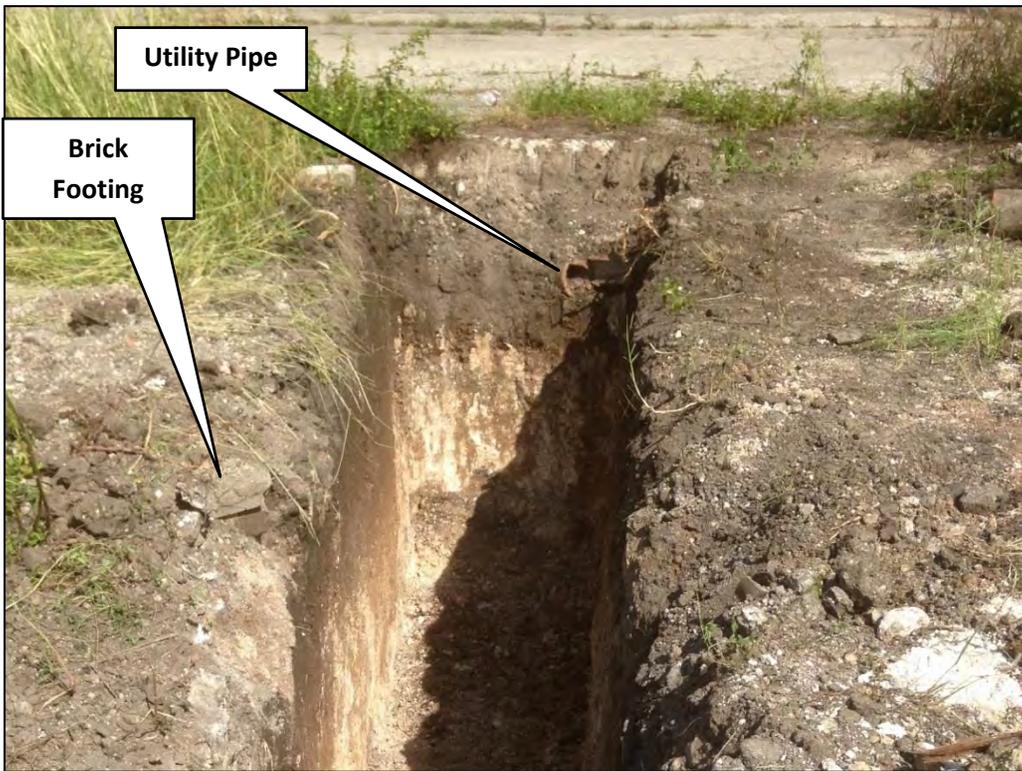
BHT 4, ceramic utility pipe in wall at southeast end of trench.
